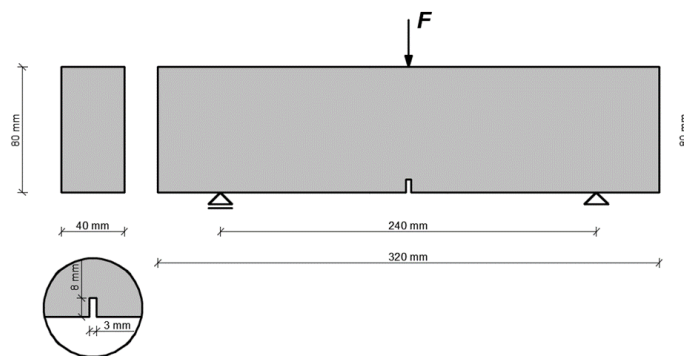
Geometry and boundary conditions of concrete beams subjected to three-point bending [4]
